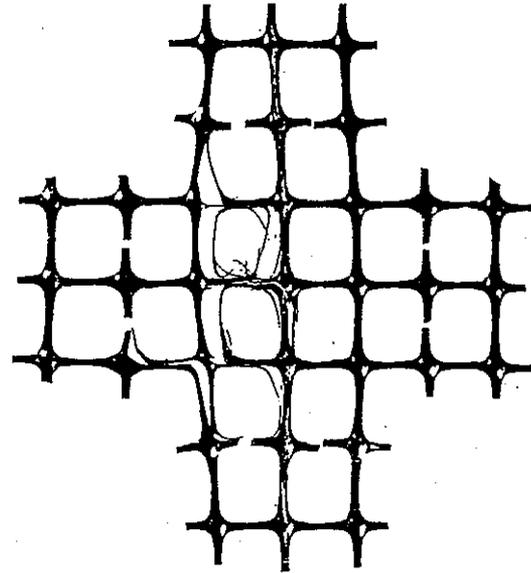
Typical failure of bi-directionally stressed three rib cross specimen
